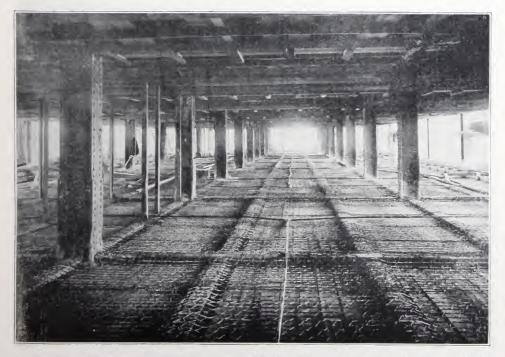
For the floors, walls, foundations, columns and beams of this storage warehouse over 200,000 square feet of Triangle Mesh Fabric was used.
